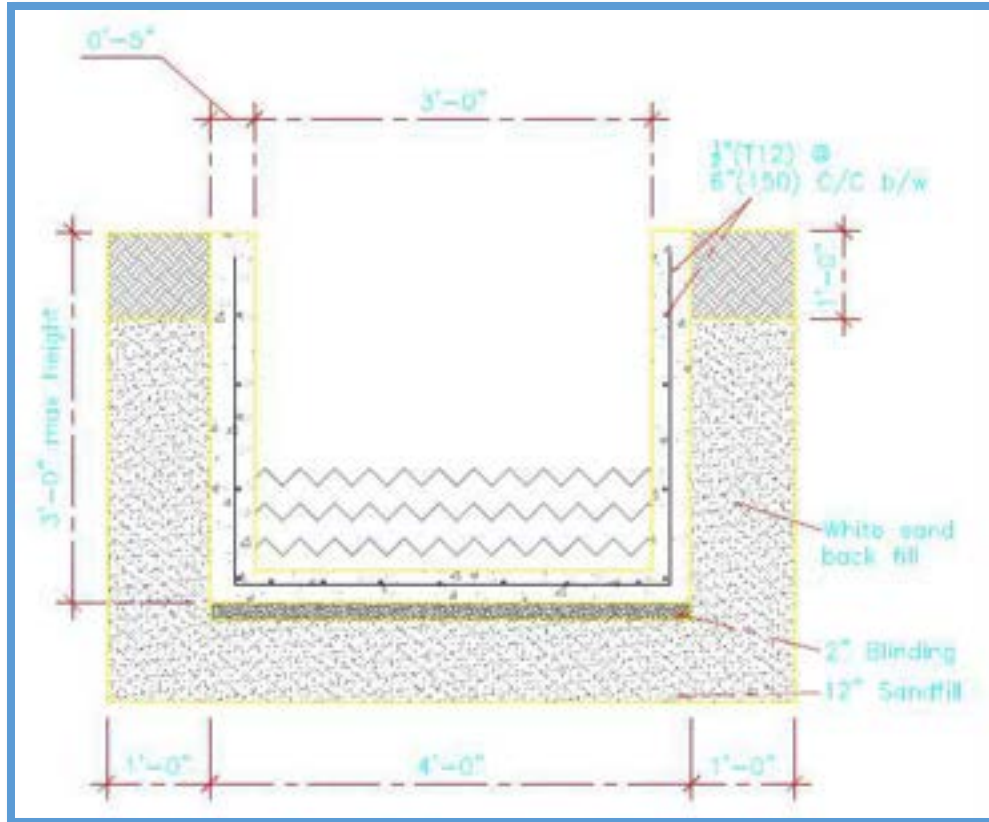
Typical Cross Section of the Reinforce Concrete Drains
